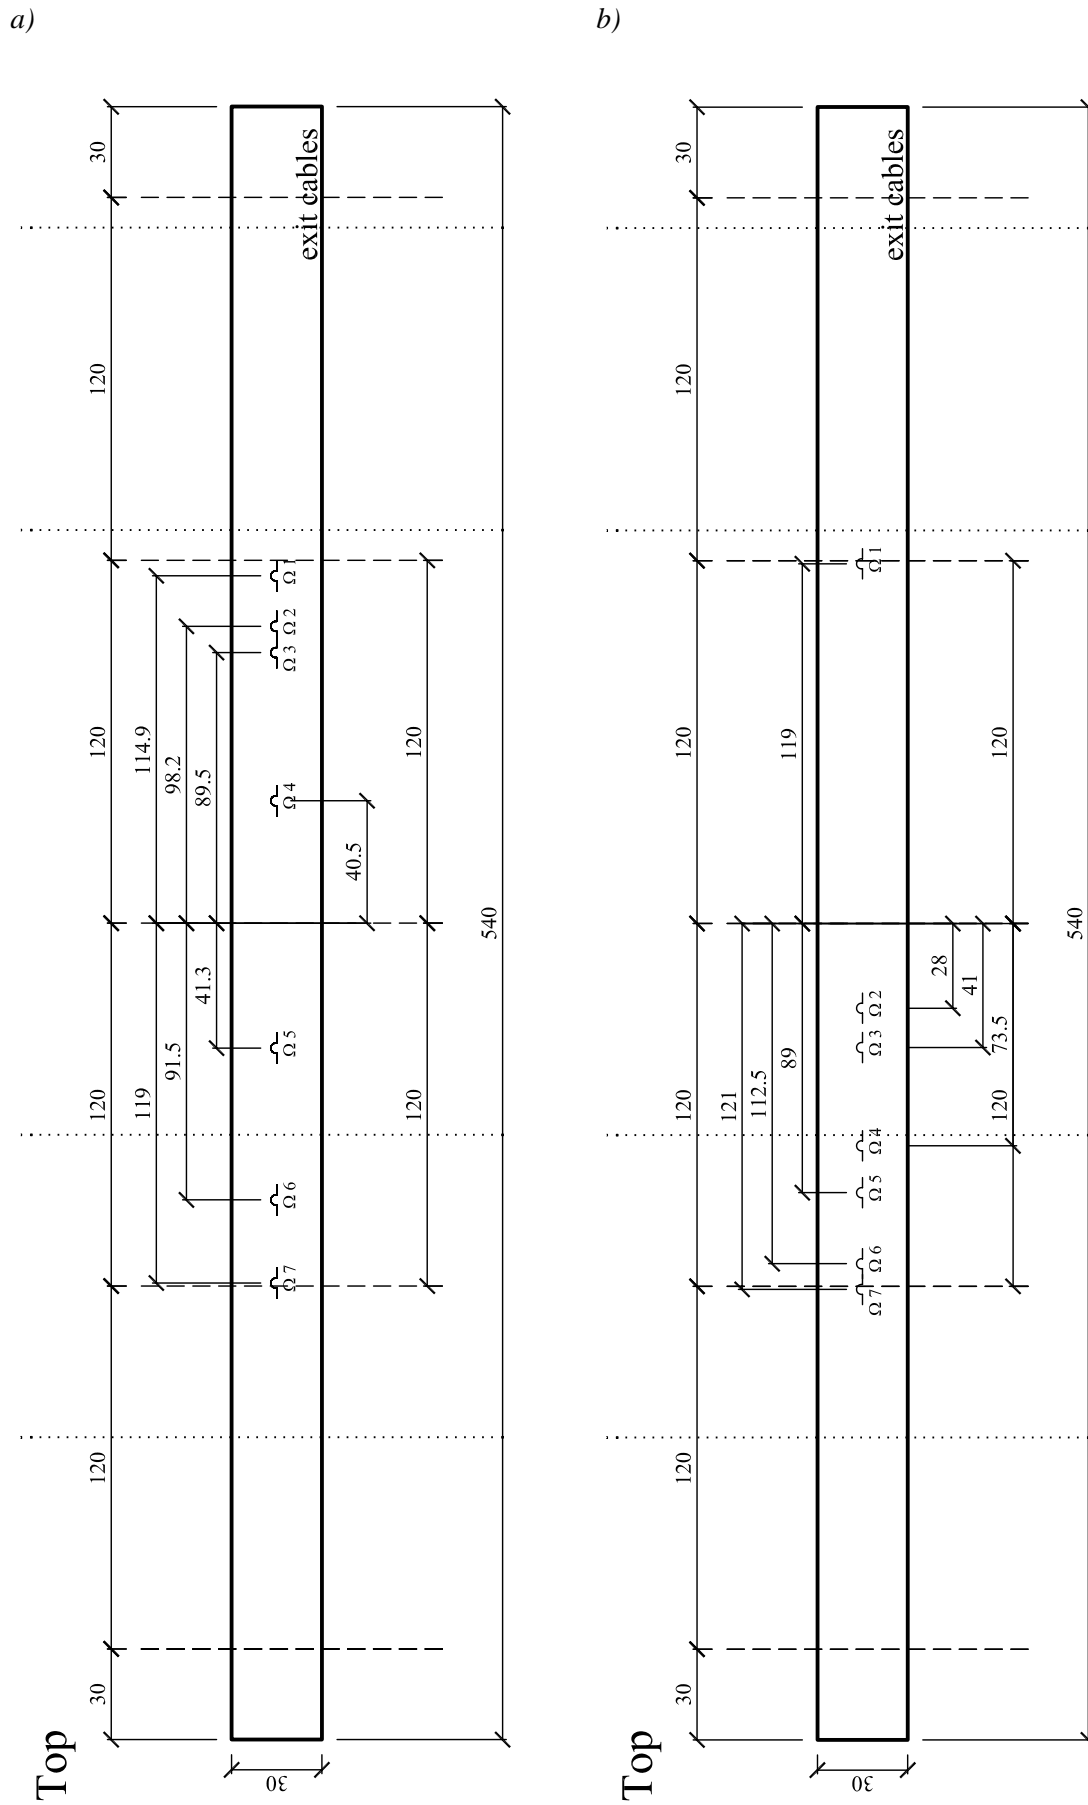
Position of the Ω -gages during the fracture test: a) 15, b) 15L
